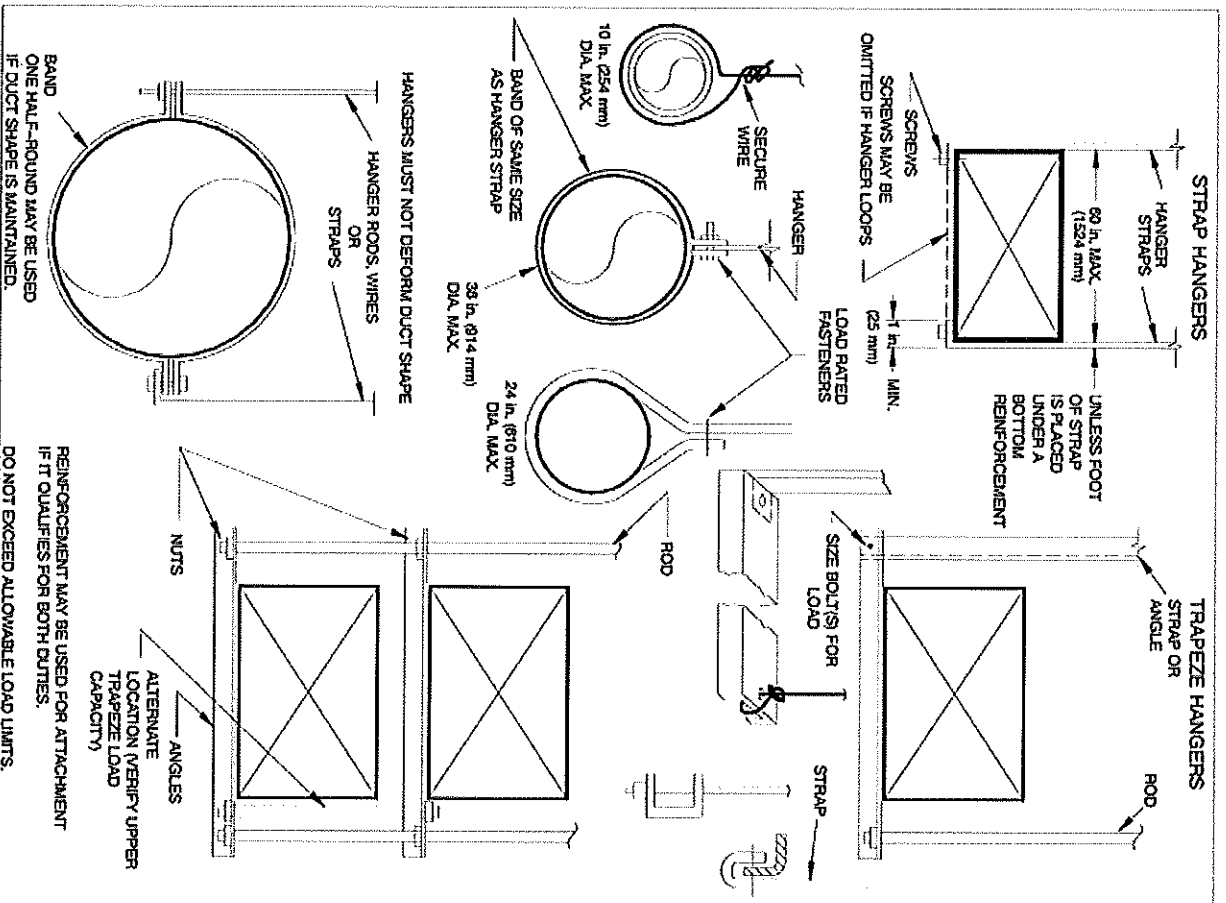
LOWER HANGER ATTACHMENTS
